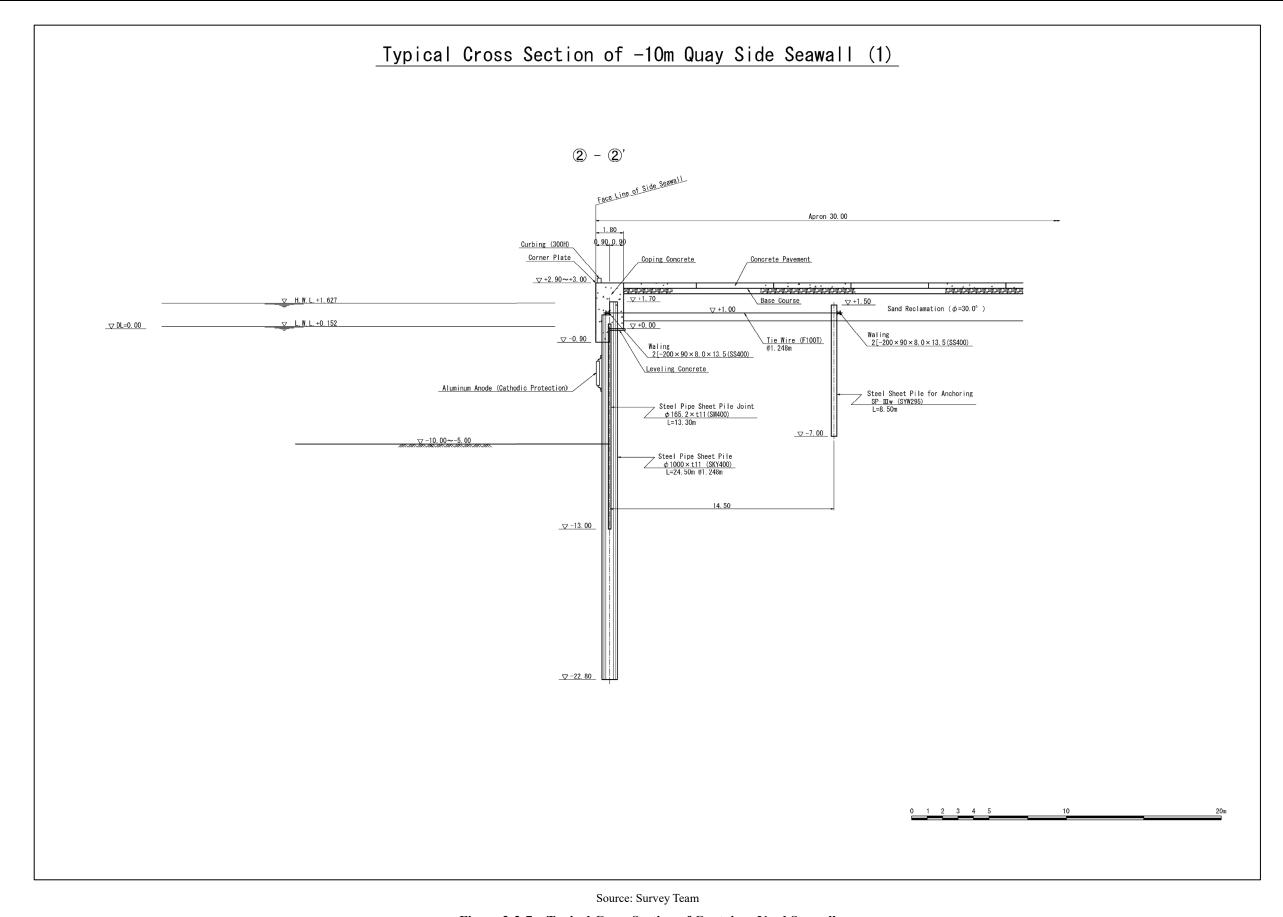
Typical Cross Section of Container Yard Seawall
